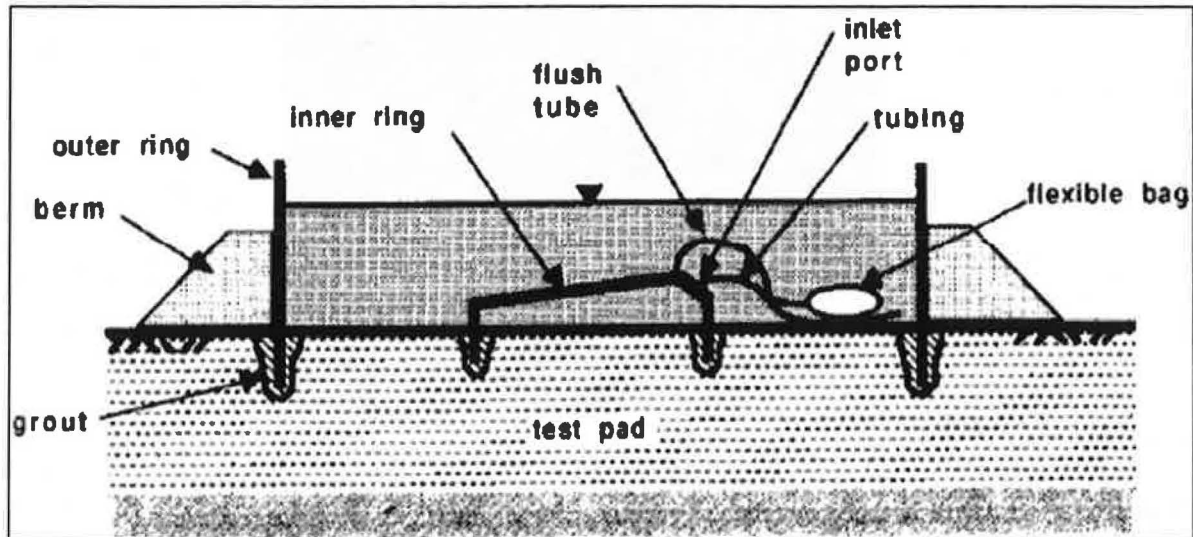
Schematic of a Sealed Double Ring Infiltrometer (ASTM D5093)
